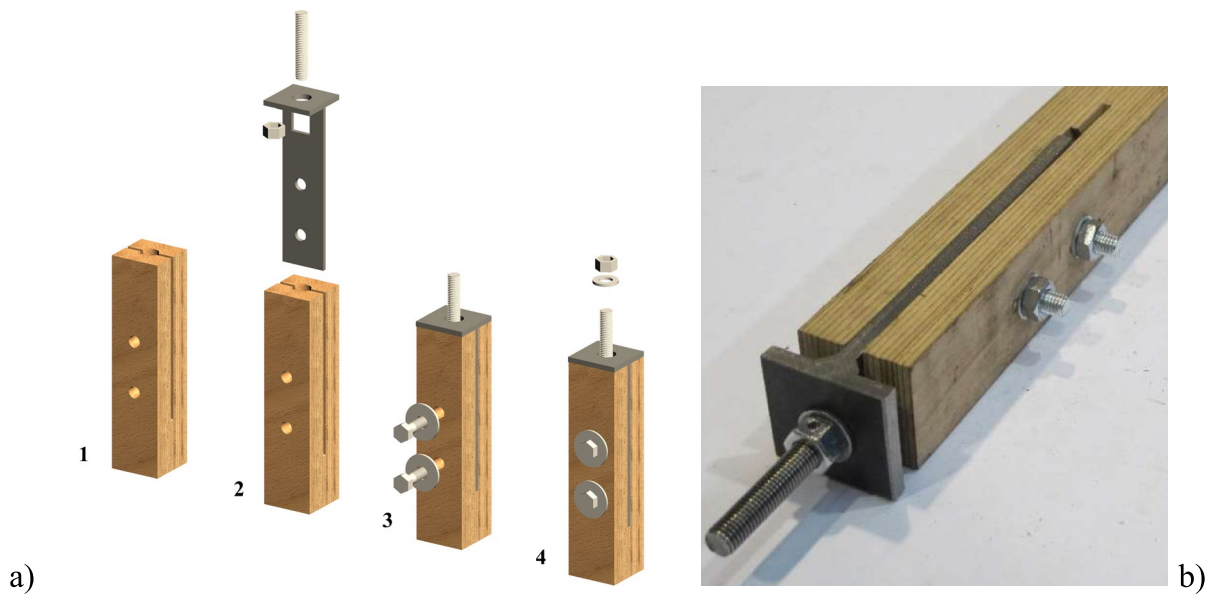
Type C connection: a assembly stages and b specimen before test
